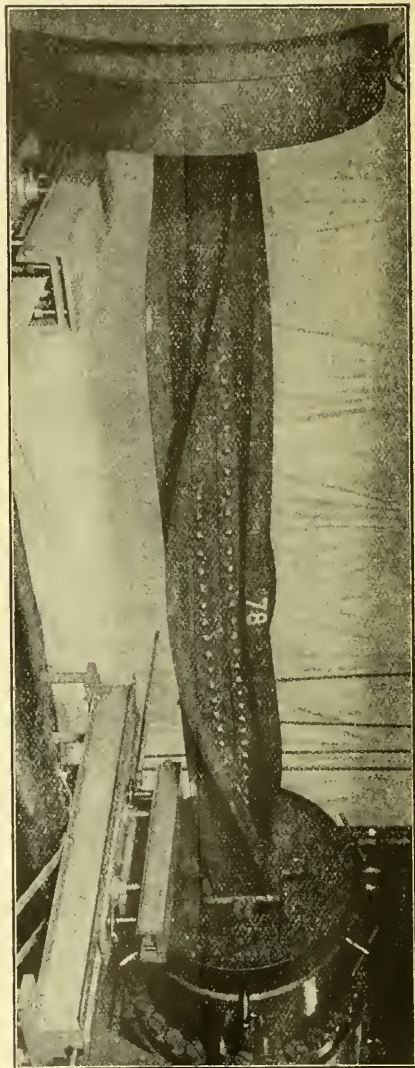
Z-BAR COLUMN. TYPE 8. LIGHT SECTION.
